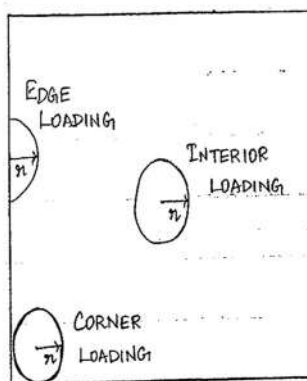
LOADING POSITIONS FOR RIGID PAVEMENT DESIGN
